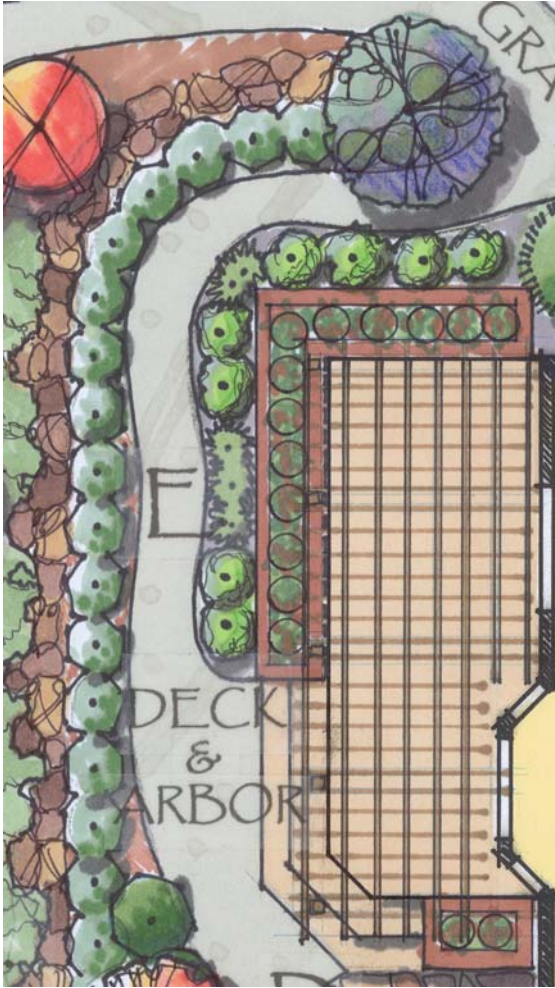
and 3.17 Sideyard Garden rendering and planting plan for the re-design
